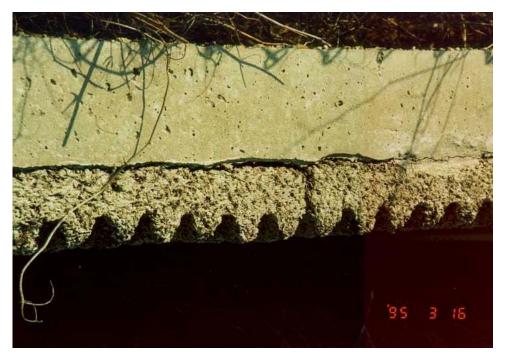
Durisol panel debonded from the concrete backing in Delaware County
